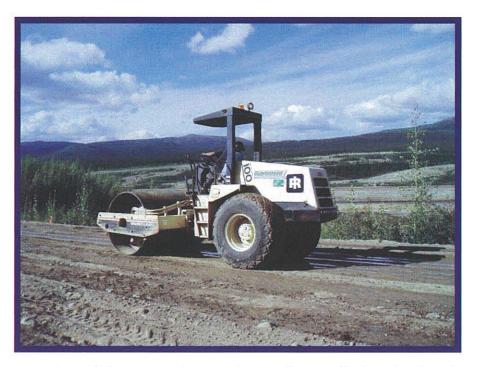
shows a view of the compacter working on the scarified and watered surface near 0+925.
